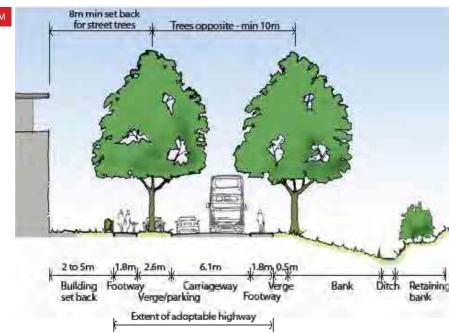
Section through Primary Road - Spine Road Northern Long Road
